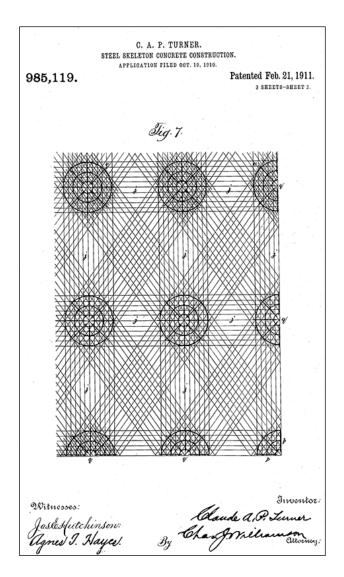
Excerpt of C.A.P. Turner's patent for a 4-way system of slab reinforcement using smooth round bars and mushroom columns. (Reproduced from M. Elliott, "Vintage Steel Reinforcement in Concrete Structures" in Structural Forensics [September 2014], online edition, www.structuremag.org.)
